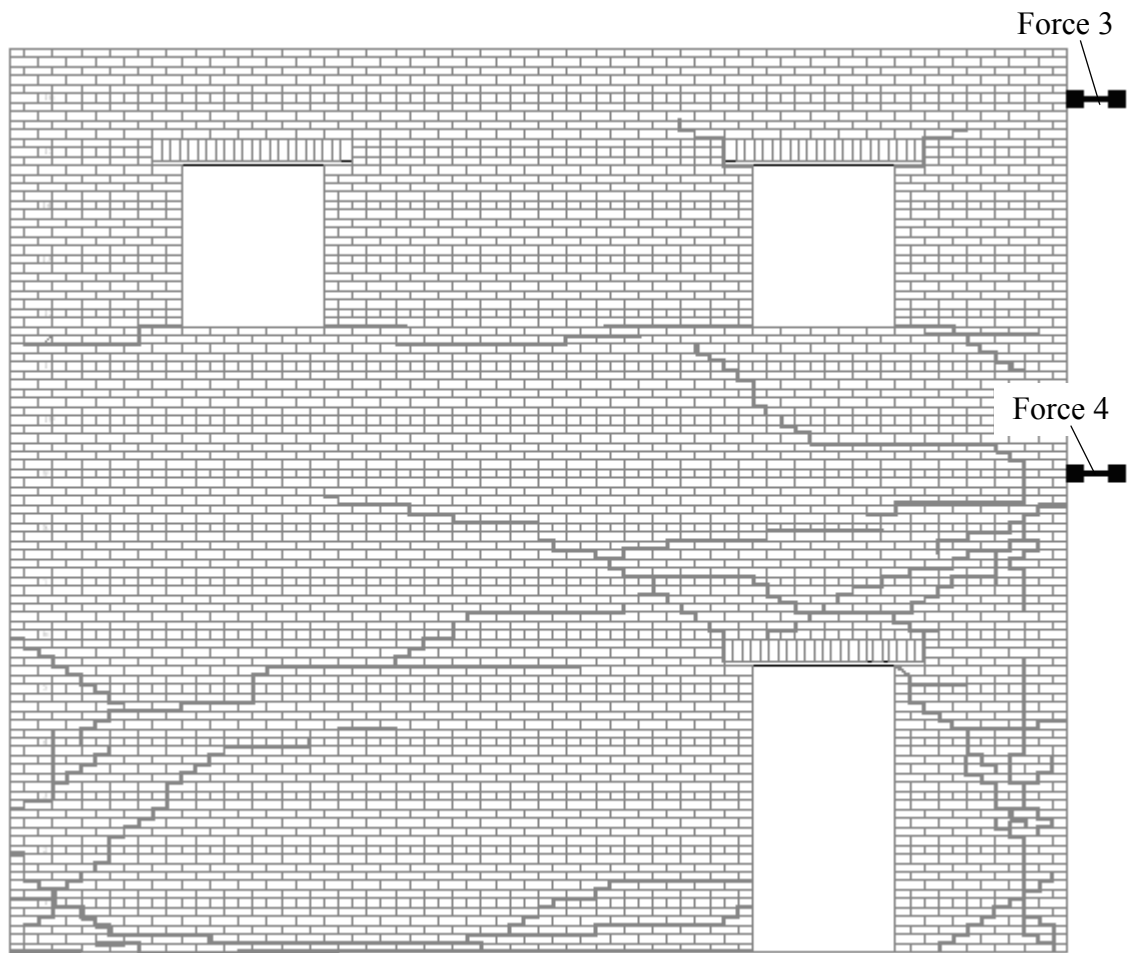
Elevation view of Wall 1 showing the location of load cells.
